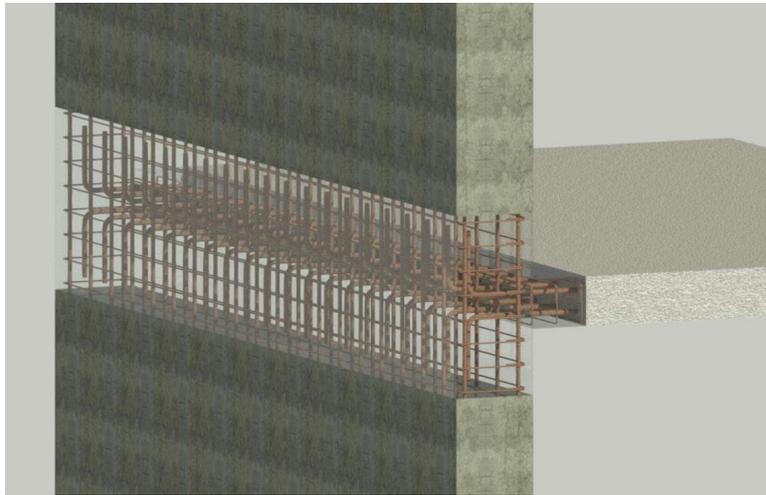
Slab to D-Wall Junction using traditional 90° Bent Hook
